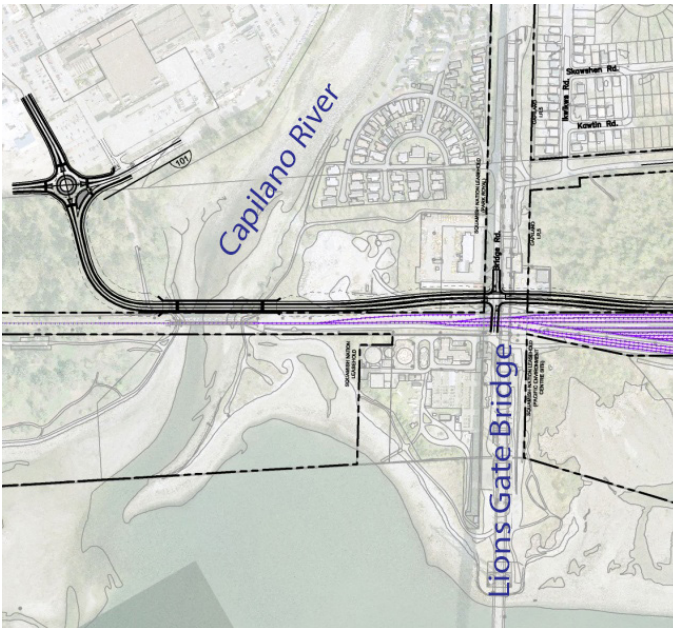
Proposed western lower level route extension to Marine Drive would see an additional vehicular crossing parallel to the rail bridge
